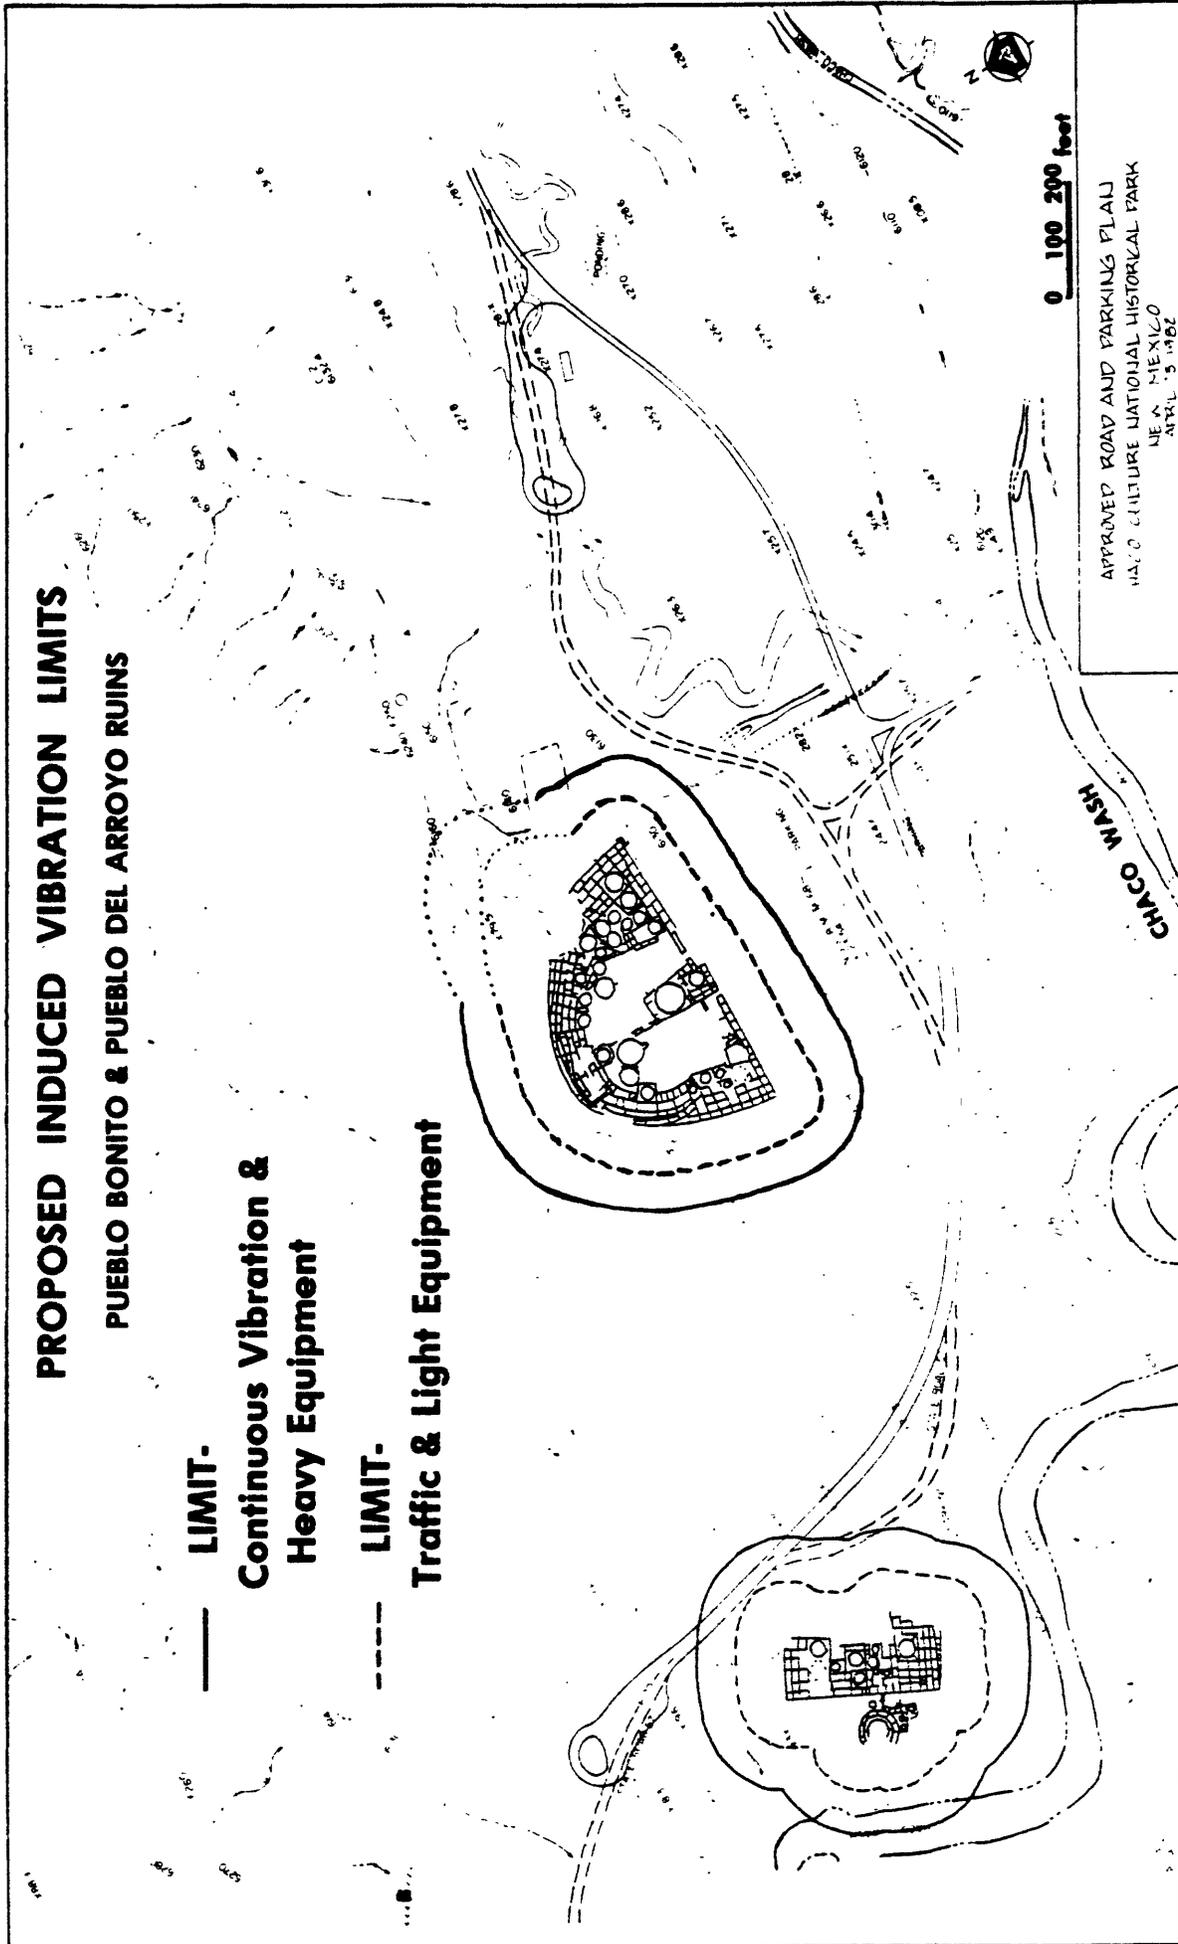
Recommended minimum distances for road building equipment and traffic.
